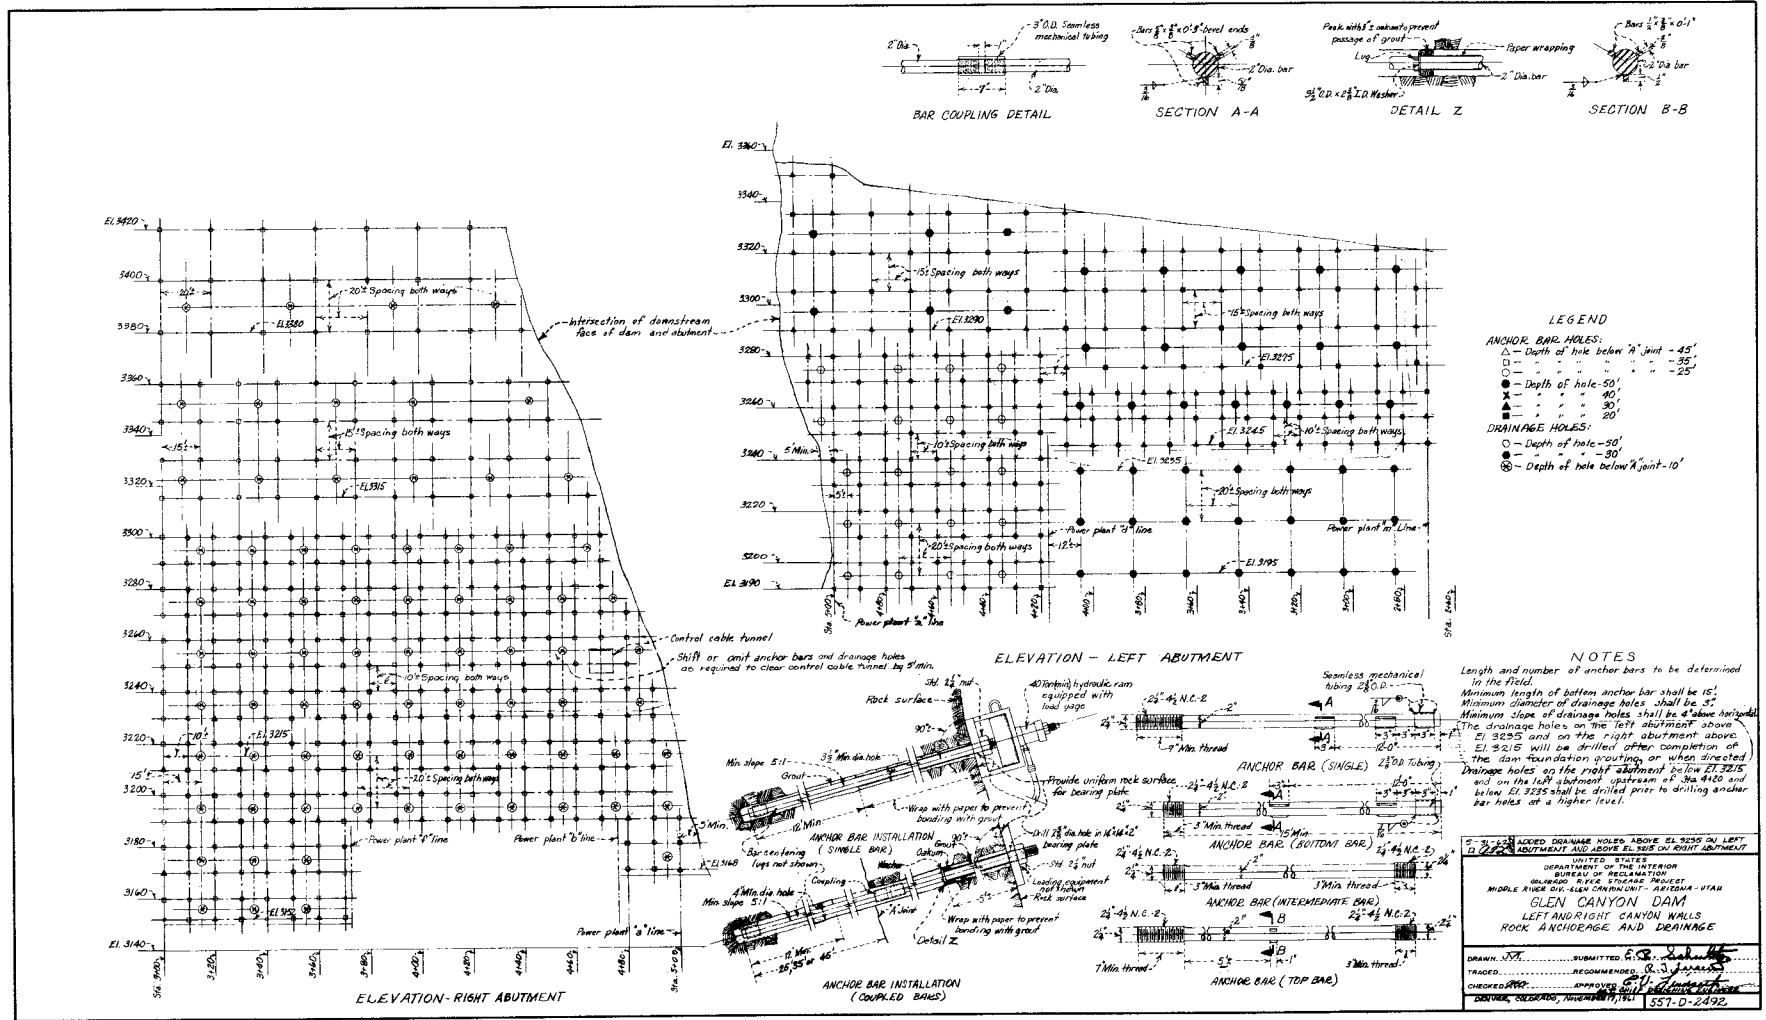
Left and right canyon walls—Rock anchorage and drainage holes.
